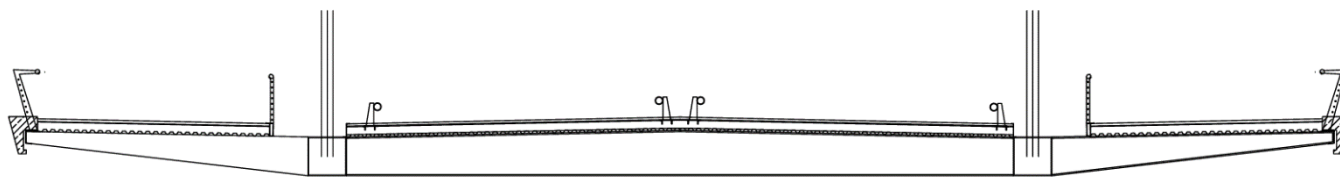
Cross-Section of Alternative 4 [Own elaboration]
